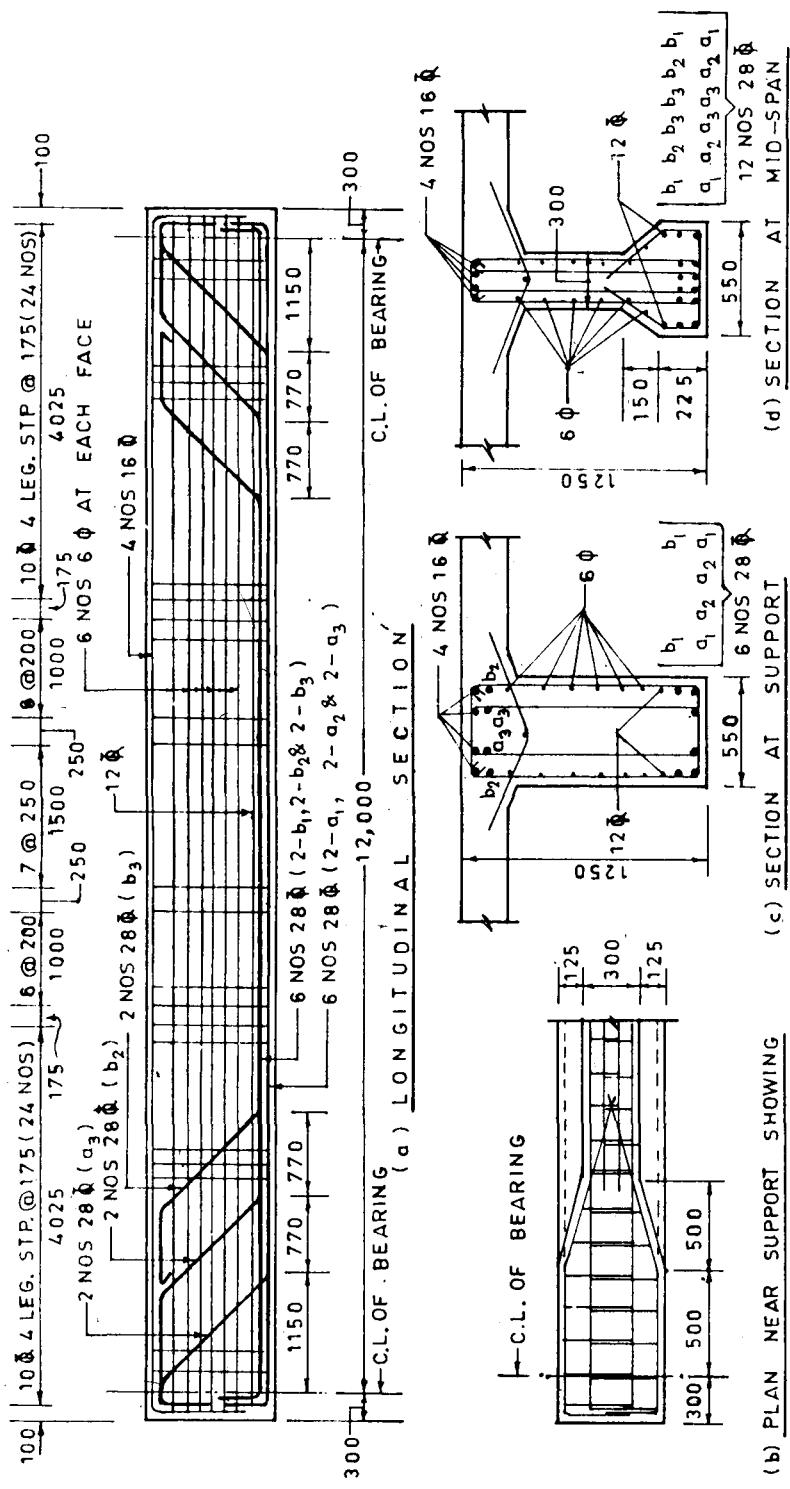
DETAILS OF REINFORCEMENT FOR CENTRAL GIRDER (Example 8.1)
